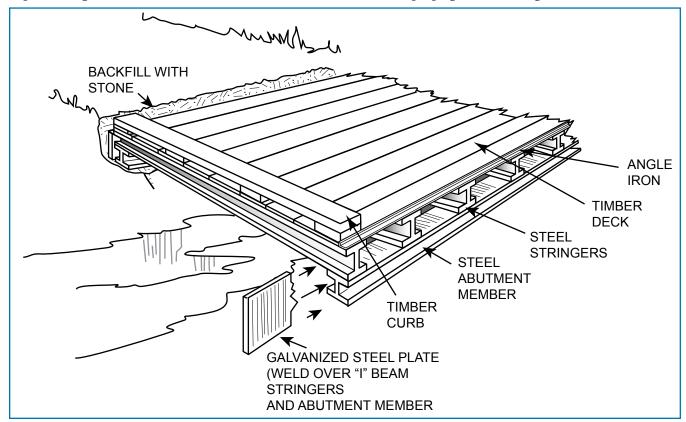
Perspective and section view of private bridge without concrete abutments
